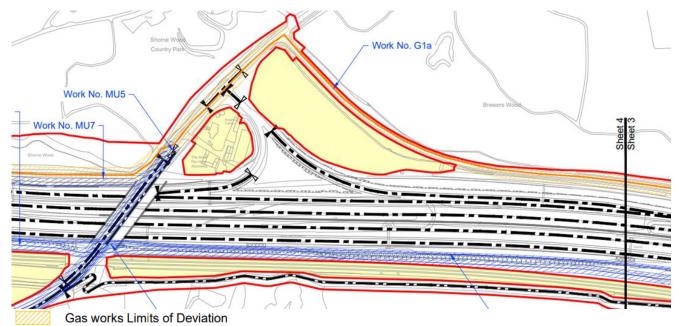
showing relocated gas pipe following Brewers Lane and A2 slip road, (From 2.6 Works Plans Volume B Utilities, sheet 4 link)
